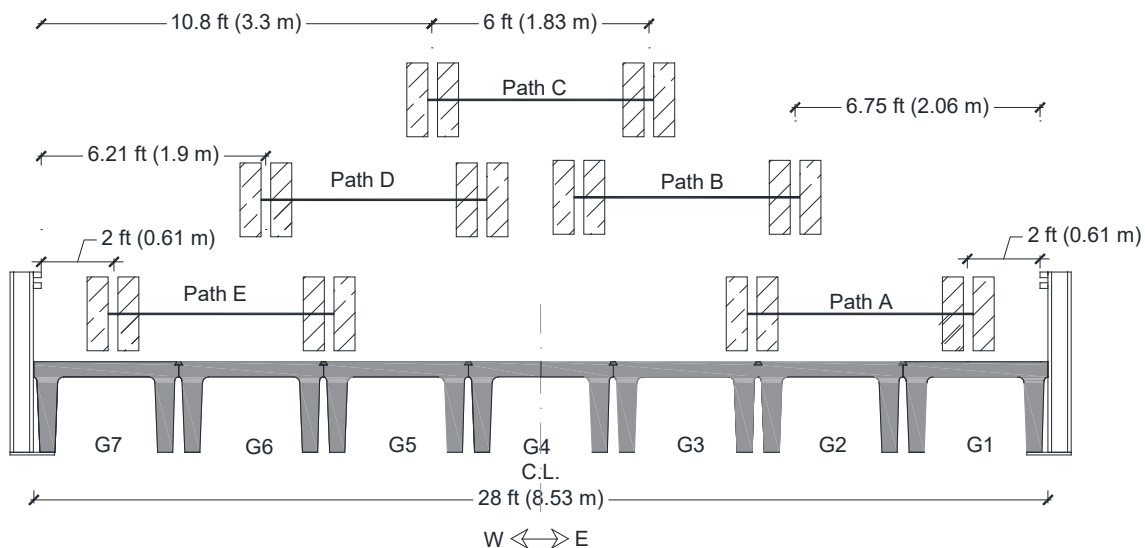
Field Test Truck Paths for 30-in. (762-mm) Deep Double-Tee Girder Bridge
